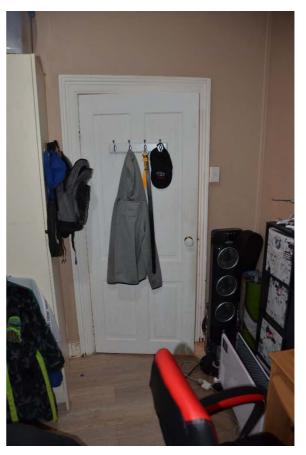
Third bedroom. Original architraves with replica four panel door, later skirtings and false
